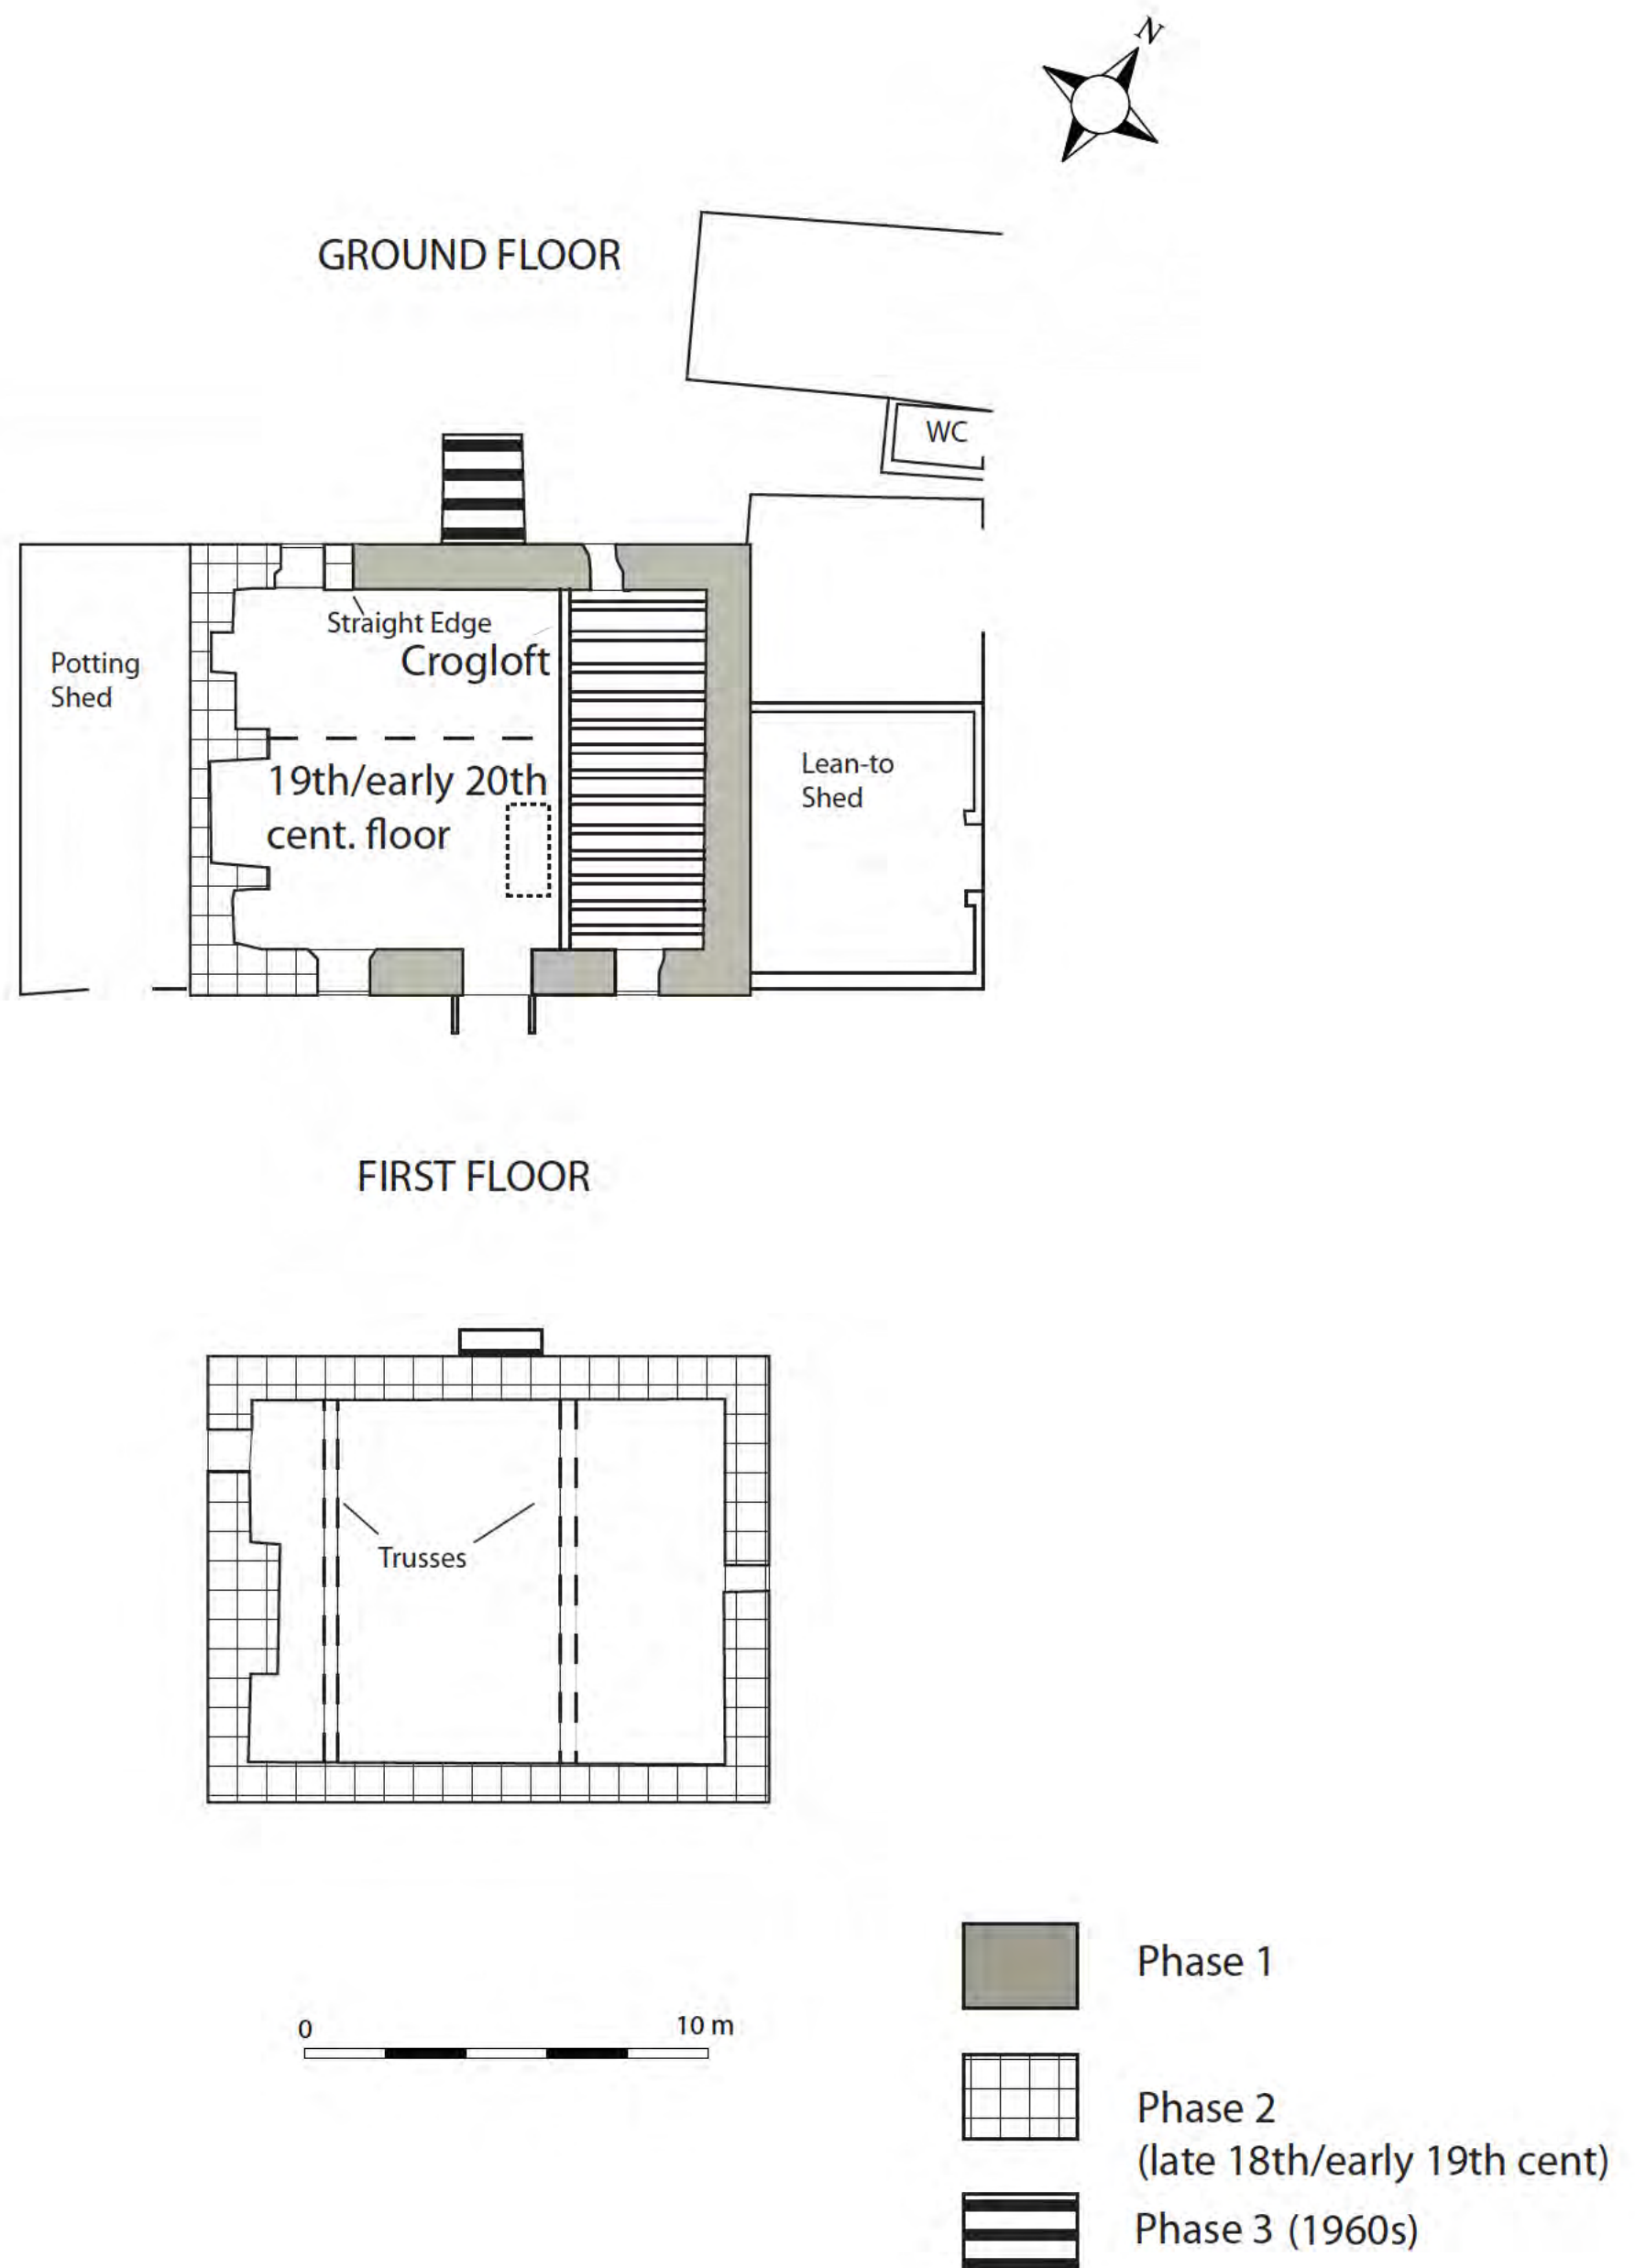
Plan of Ground and First Floor of Scybor Rhent, Tudweiliog
